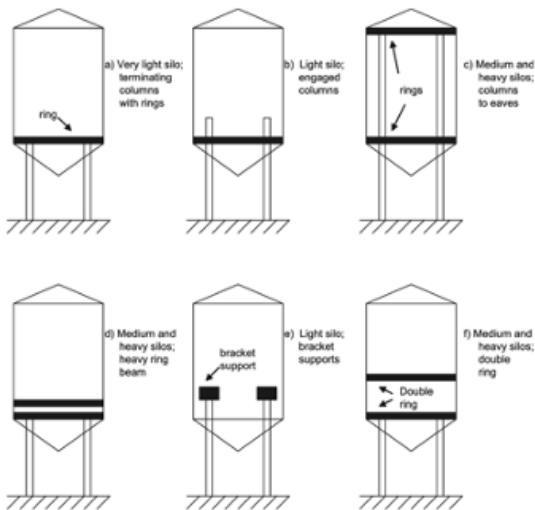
Alternative arrangement for silos with different supporting structures (Rotter, 2001).
